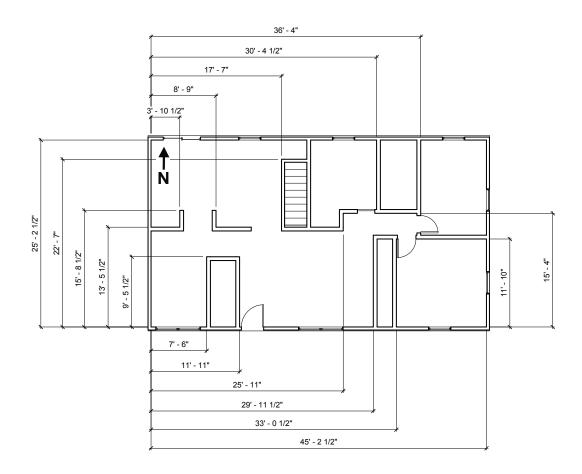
Fully Dimensioned Floor Plan of the First Floor
